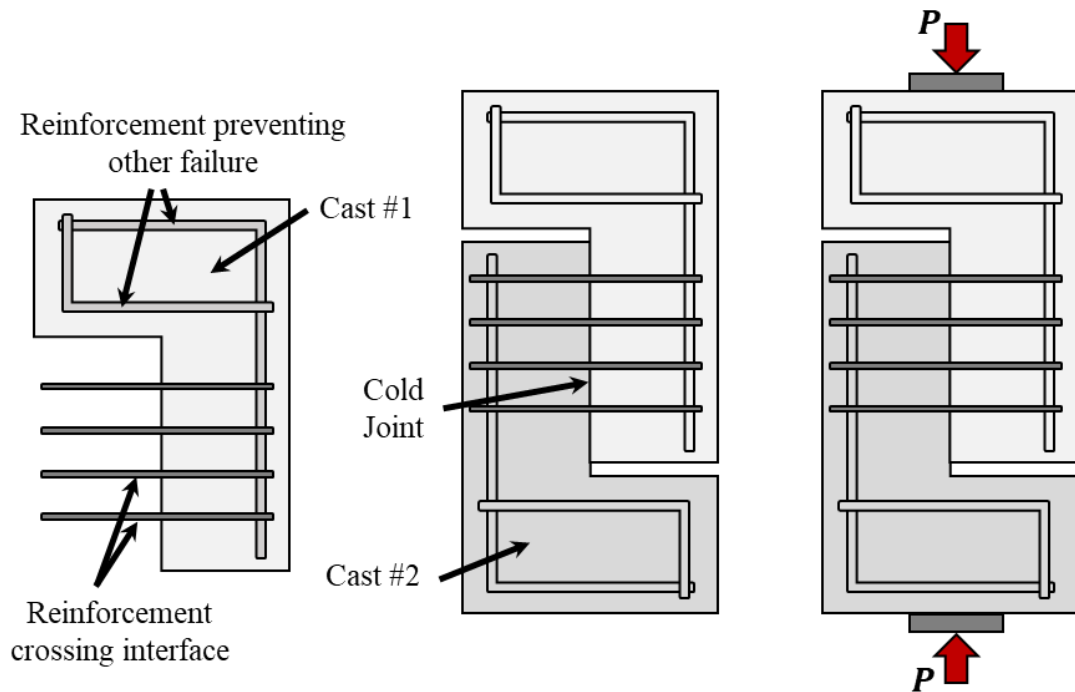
Typical casting and testing procedure for push-off tests: (a) casting of first L-shaped component, (b) casting of second L-shaped component, and (c) testing and loading (designated by P) of push-off specimen
